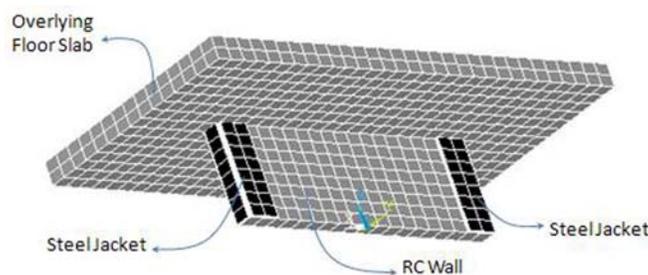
Finite element model of RC wall strengthened by steel jackets
